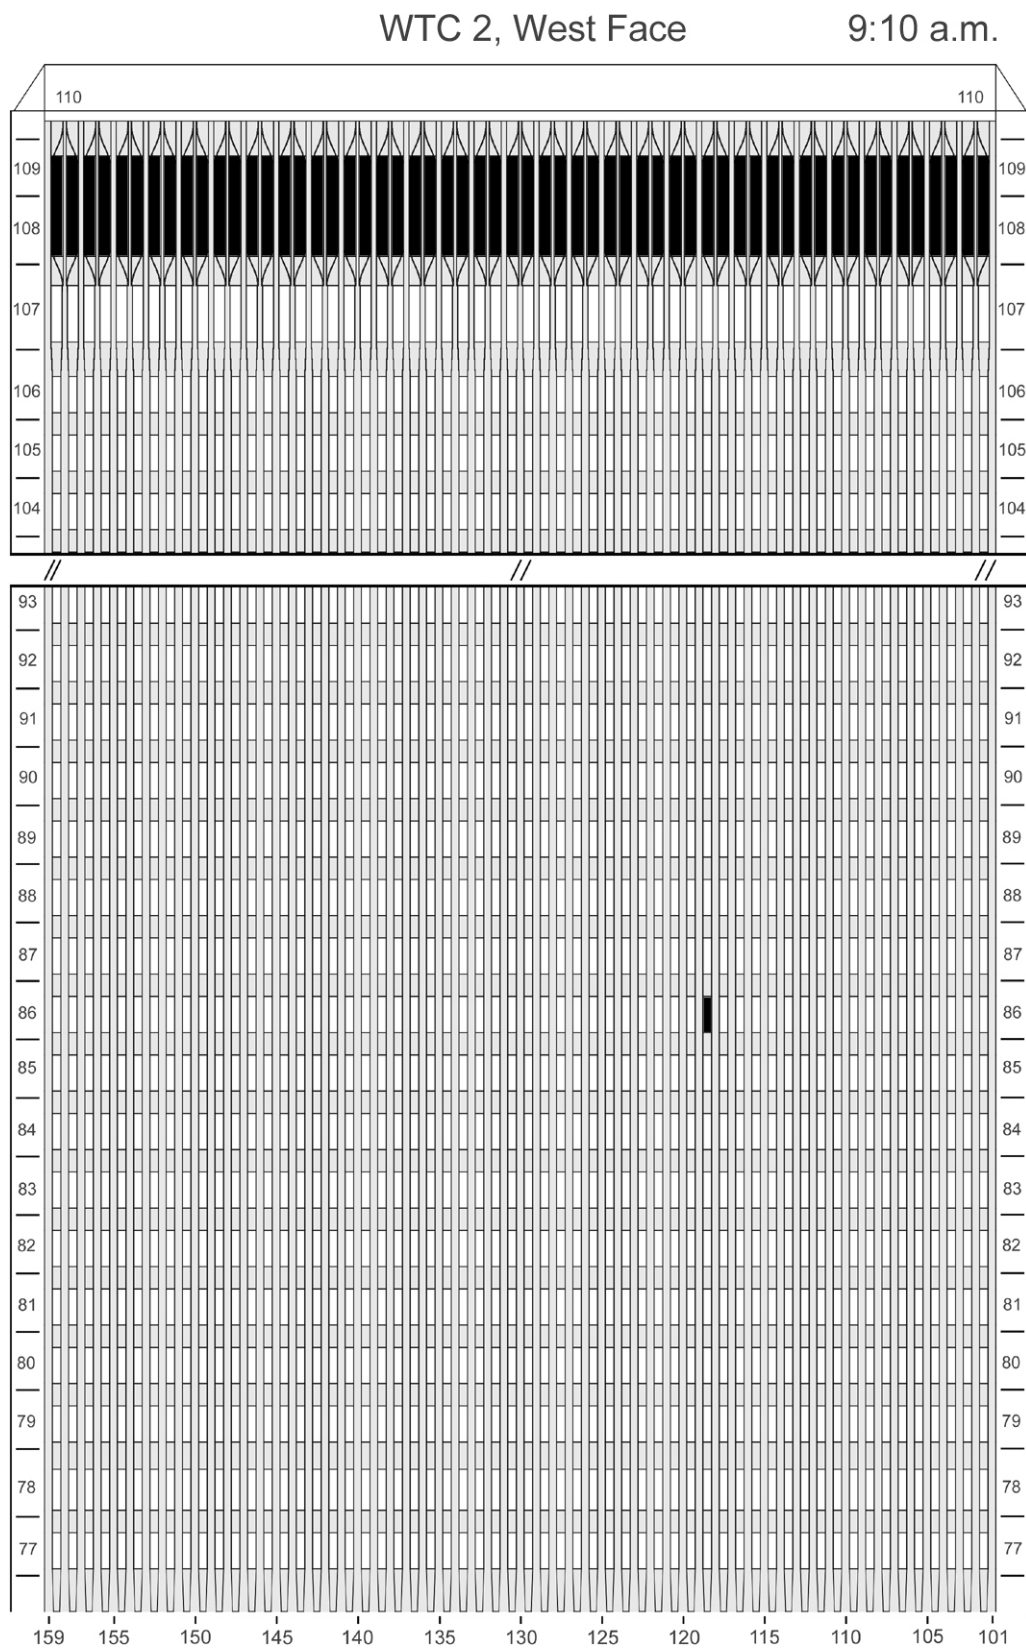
Diagram of the west face of WTC 2 for floors 77 to 93 and floors 104 to 110 at 9:10 a.m. showing the condition of windows and locations of fires.
